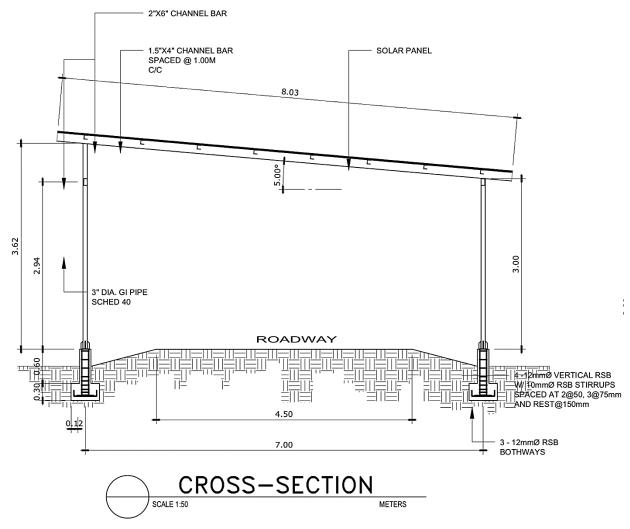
Cross section of the structure support for the ground mount solar installations.
